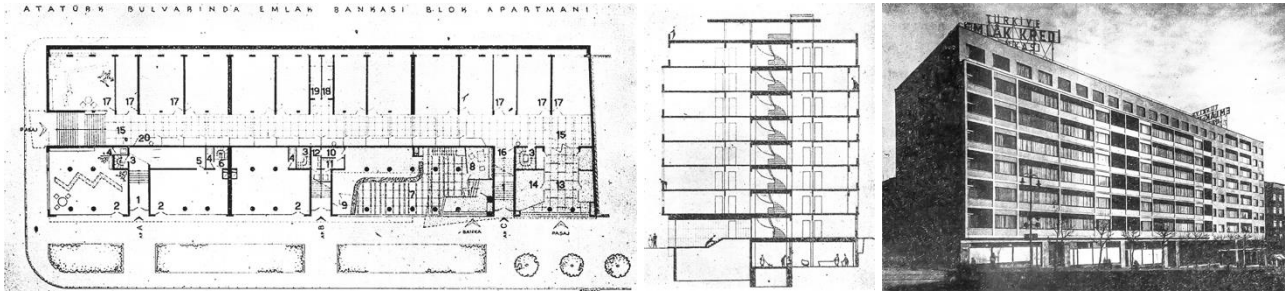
Atatürk Boulevard Block Apartment, ground level plan (left) and section, showing the interior street (center), and view from the main street (right; 1957) [19].
